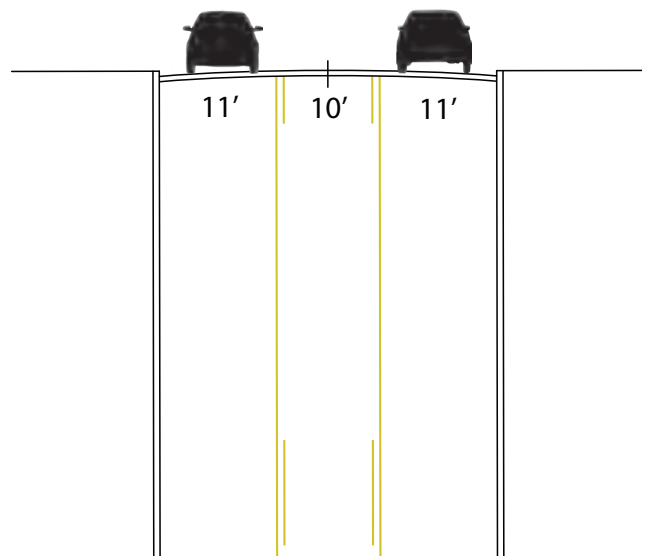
Option 1 - 32-feet of Broad Street with Two 11-foot Travel Lanes and a 10-foot Central Turning Lane
